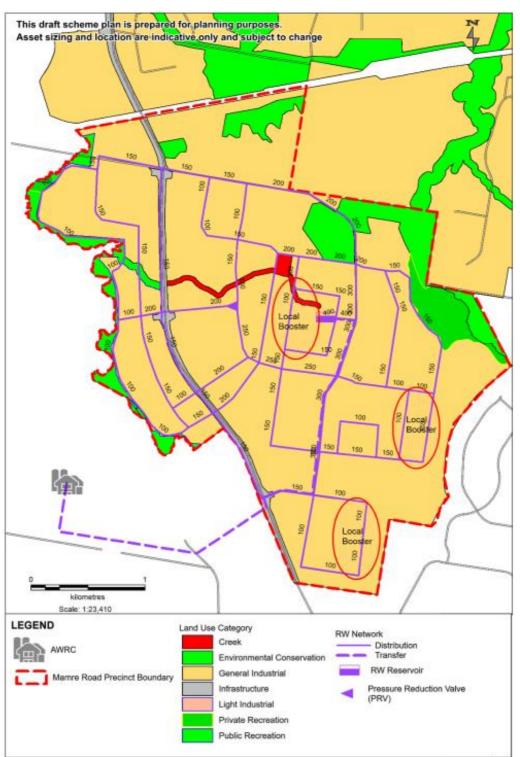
Draft Mamre Road Recycled Water Scheme Plan
